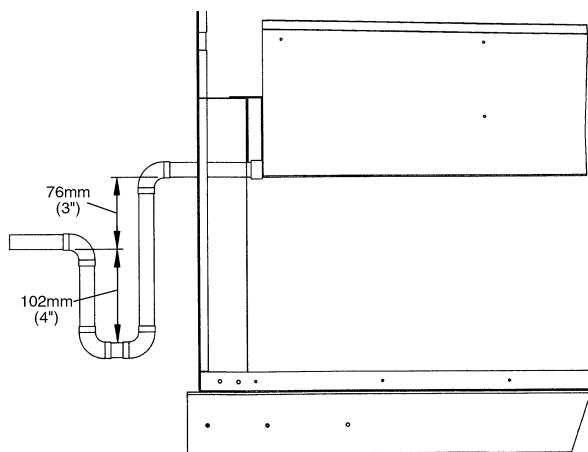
Condensate Drain Trap Piping Details (Typical Roof Curb or Slab Mount Shown)
